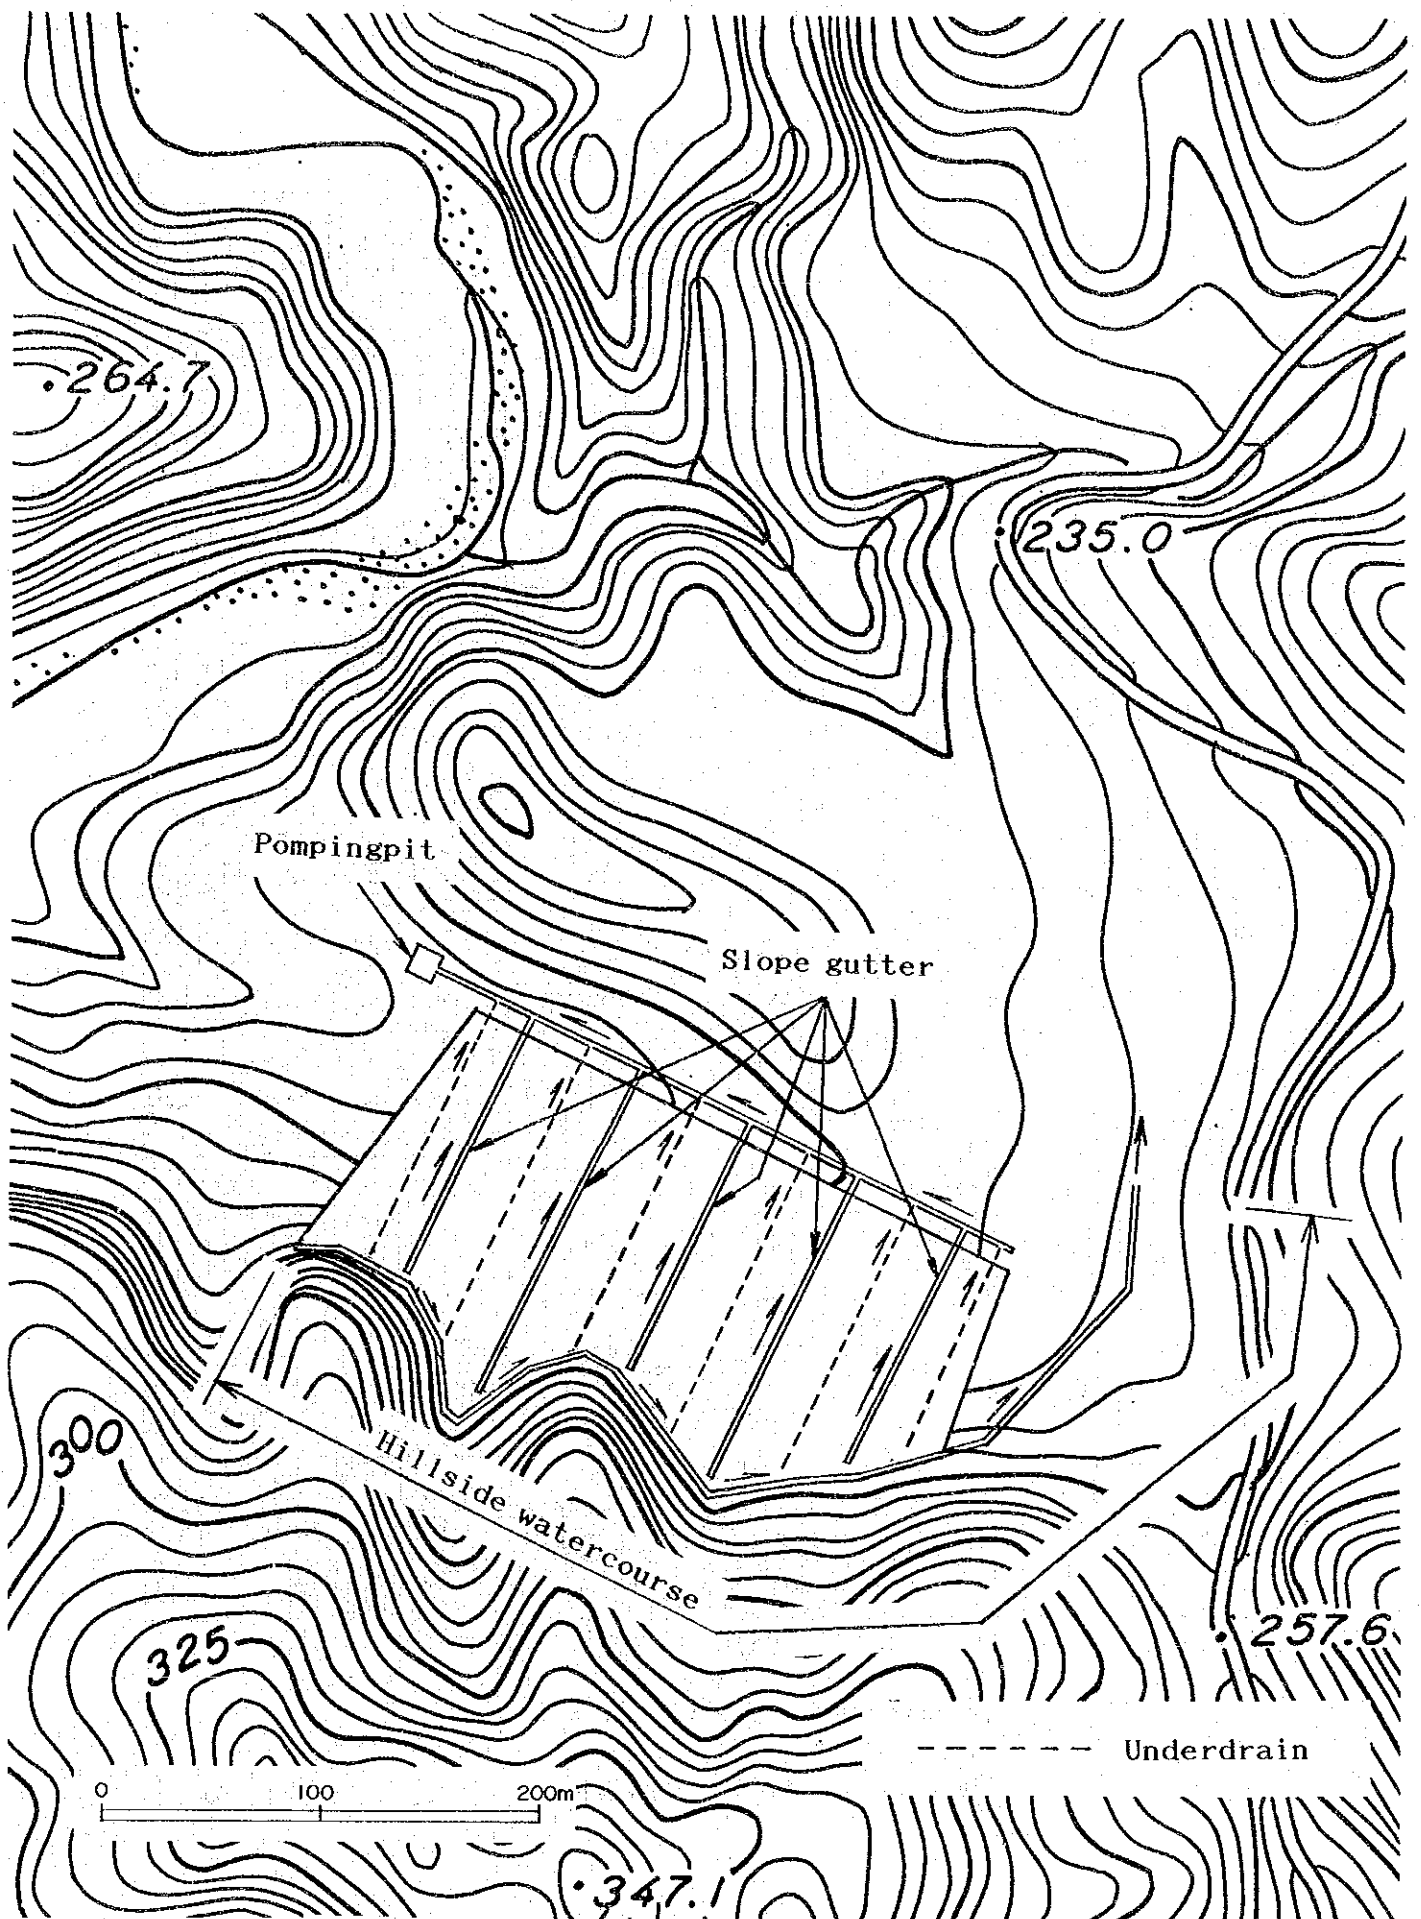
New El Coco Tailing Dam Drainage Plan
